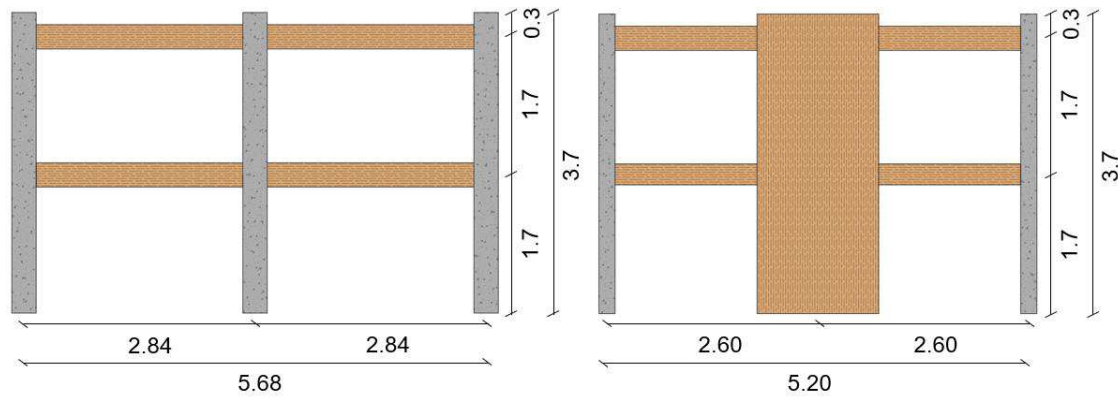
Global dimensions of the Test Building in the frame - or longitudinal - (left) and wall - or transversal - (right) directions.
